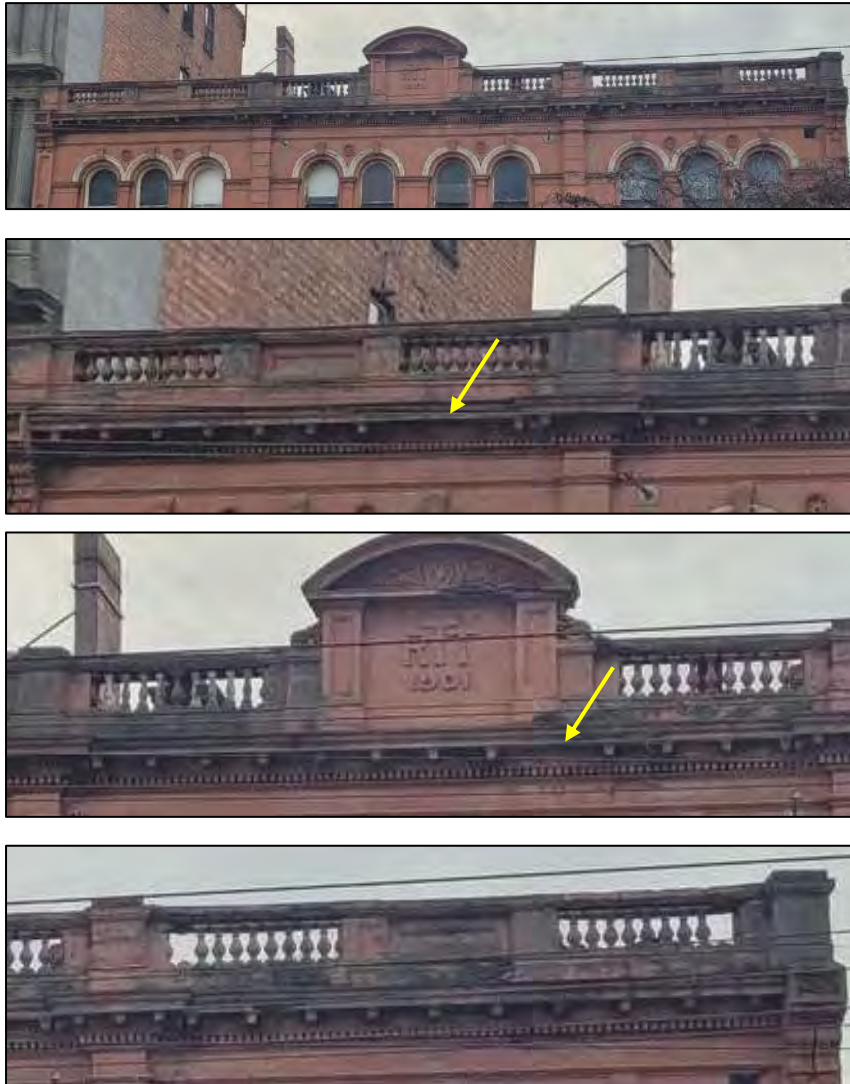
Detail view of the general render repairs to parapet baluster and detailing.
